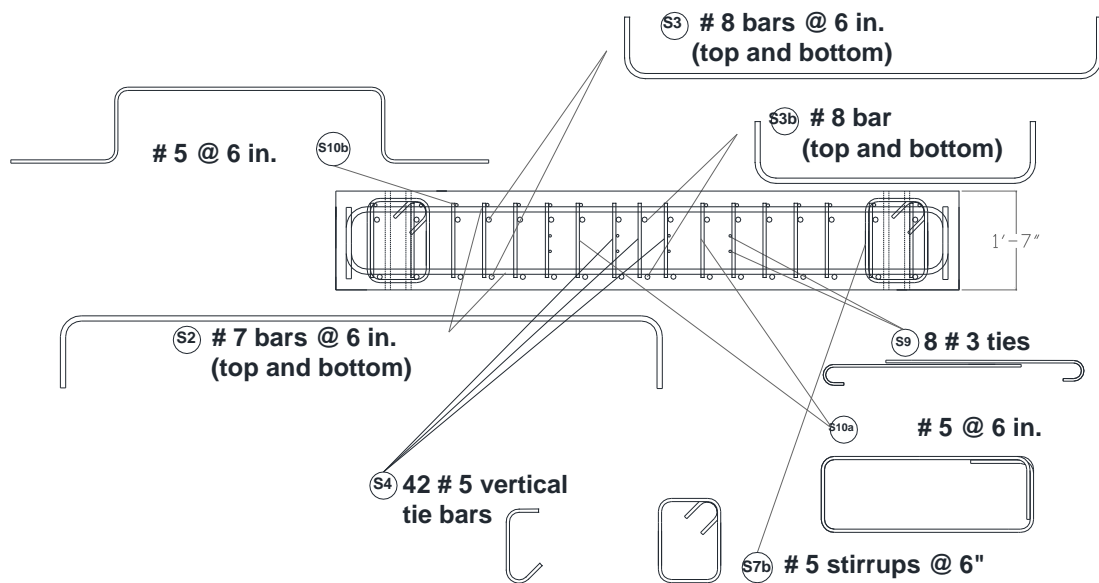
Elevation view of slab reinforcement at Section CC for Specimen #3
